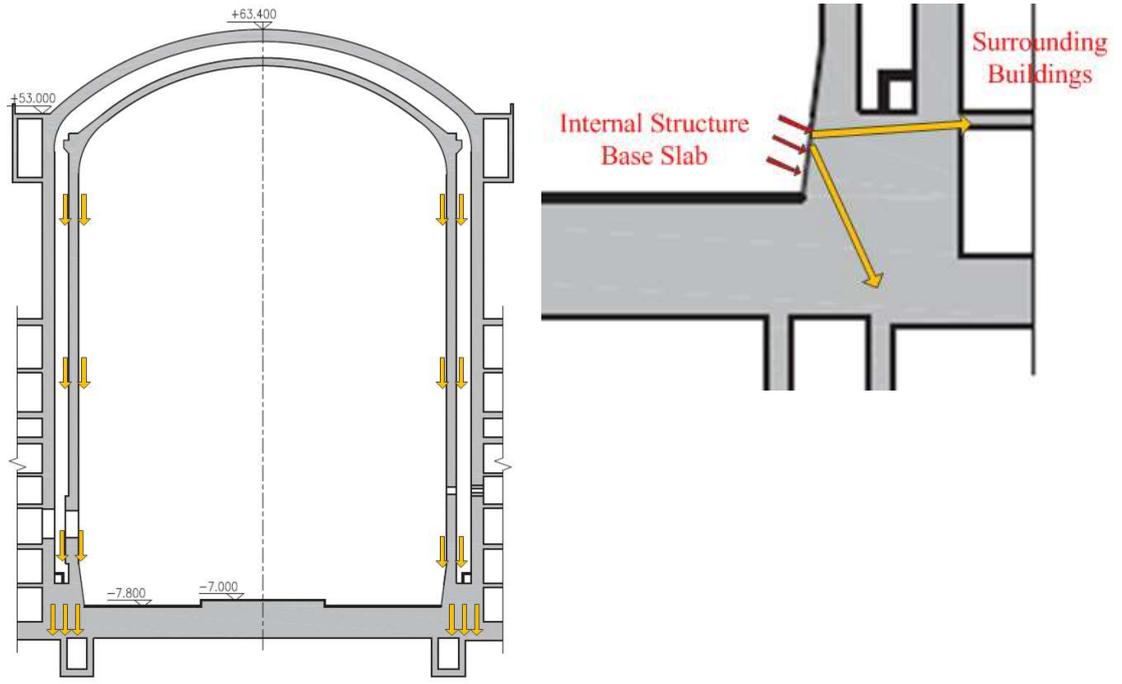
Extract of a drawing of the elevation view, showing the raft foundation profile and prestressing gallery
